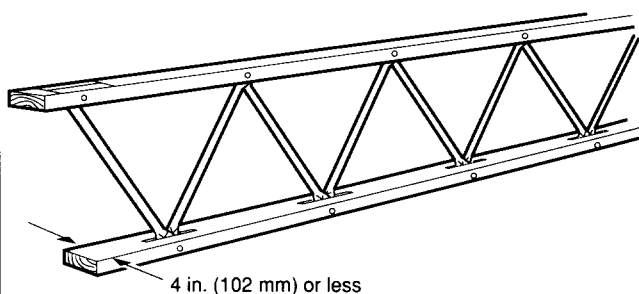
(b)(i)1 Wood bar joist construction.
